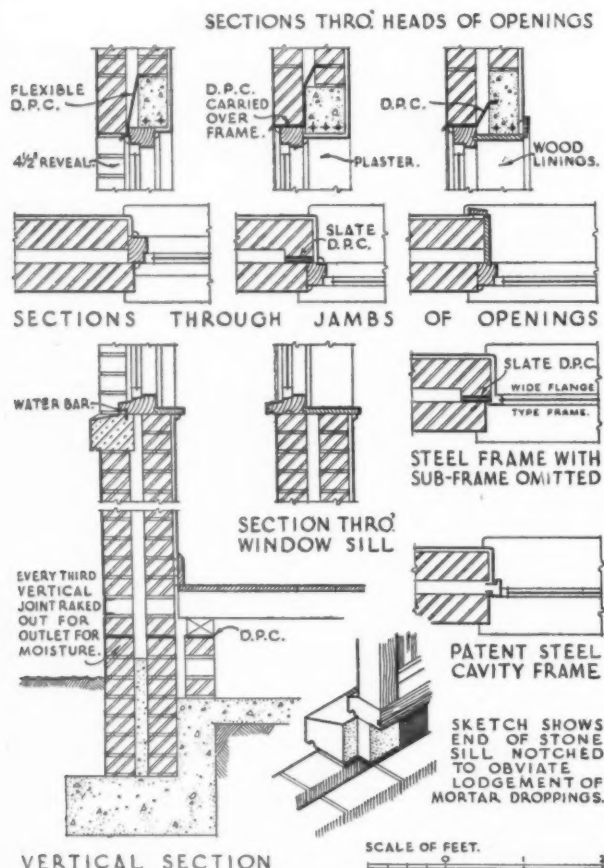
Cavity brickwork. Recommended details for preventing moisture reaching the inner skin at window openings and at the foot of the cavity.
